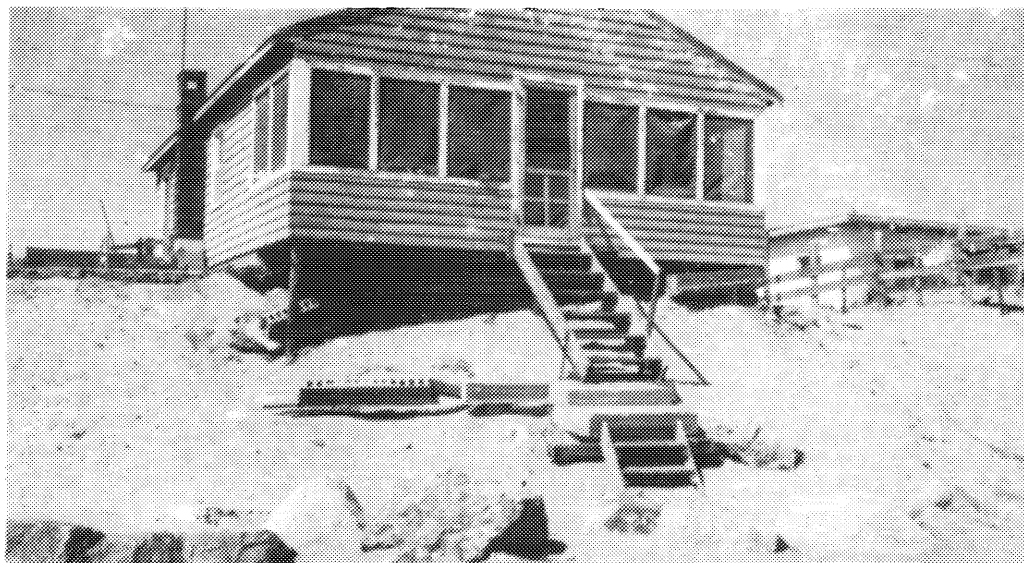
July 1966. Cottage undermined by storms near Groin 5.
